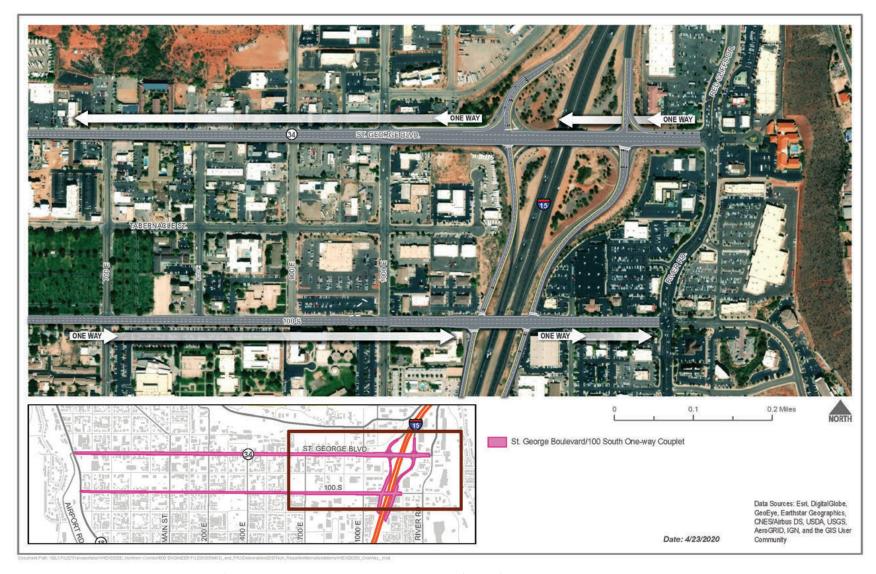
St. George Boulevard/100 South One-way Couplet Plan View (3 of 4)
